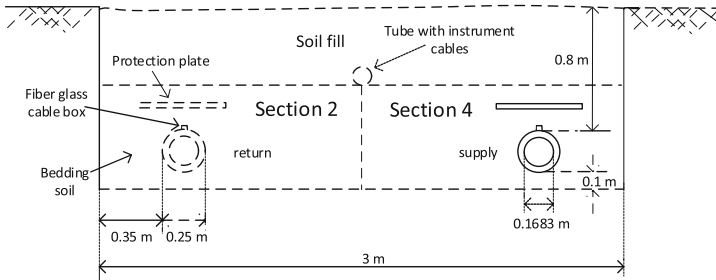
Trench cross section A – A with pipes of sections 2 and 4
